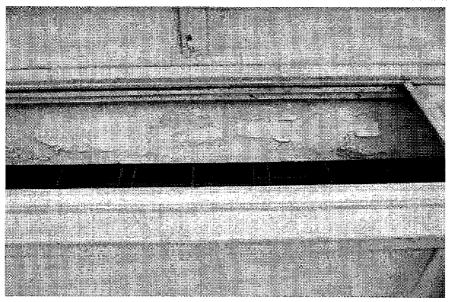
White paint with elevated levels of lead on the lintel and ceilings of the commercial tenancy at 89 Liverpool Road.
